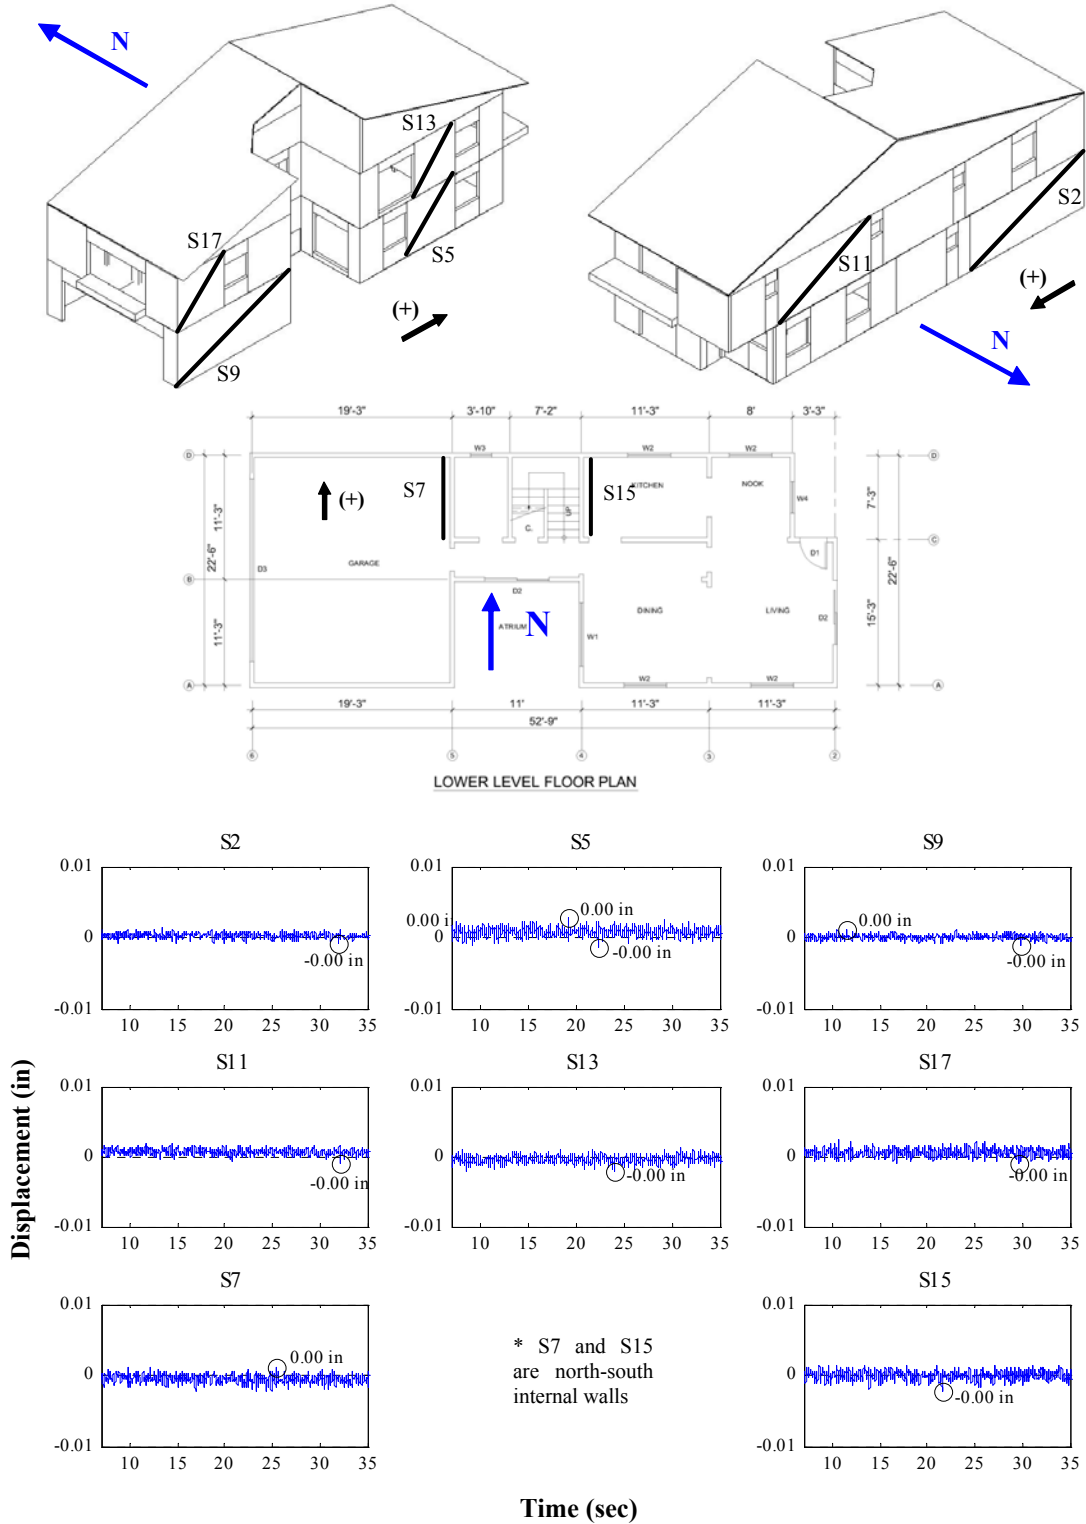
Wall deformations of east-west internal walls for Test NWP2S02
